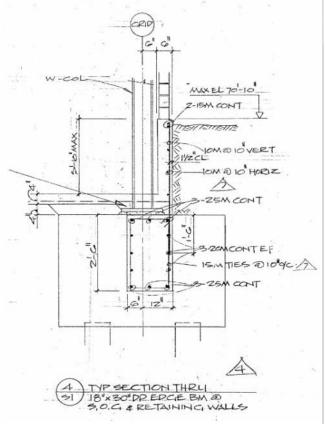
Detail from structural drawings showing column, grade beam, and piles
